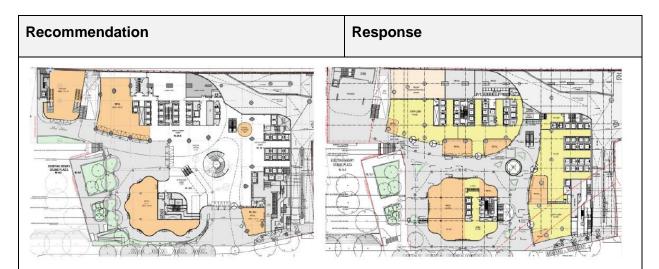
Comparison of the previously submitted (left) and the proposed (right) Upper Ground Floor Plan.
